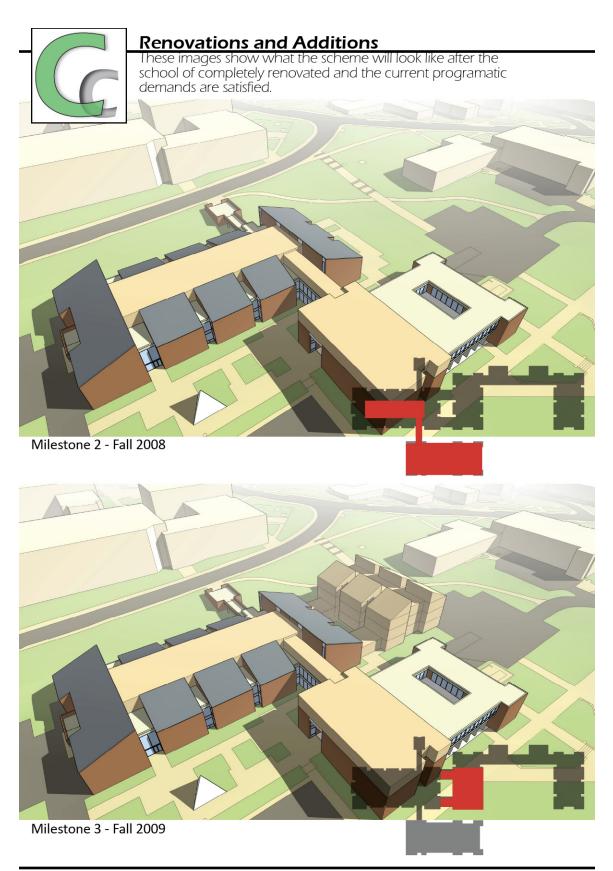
Meeting 1 - Scheme C - Renovations and Additions
